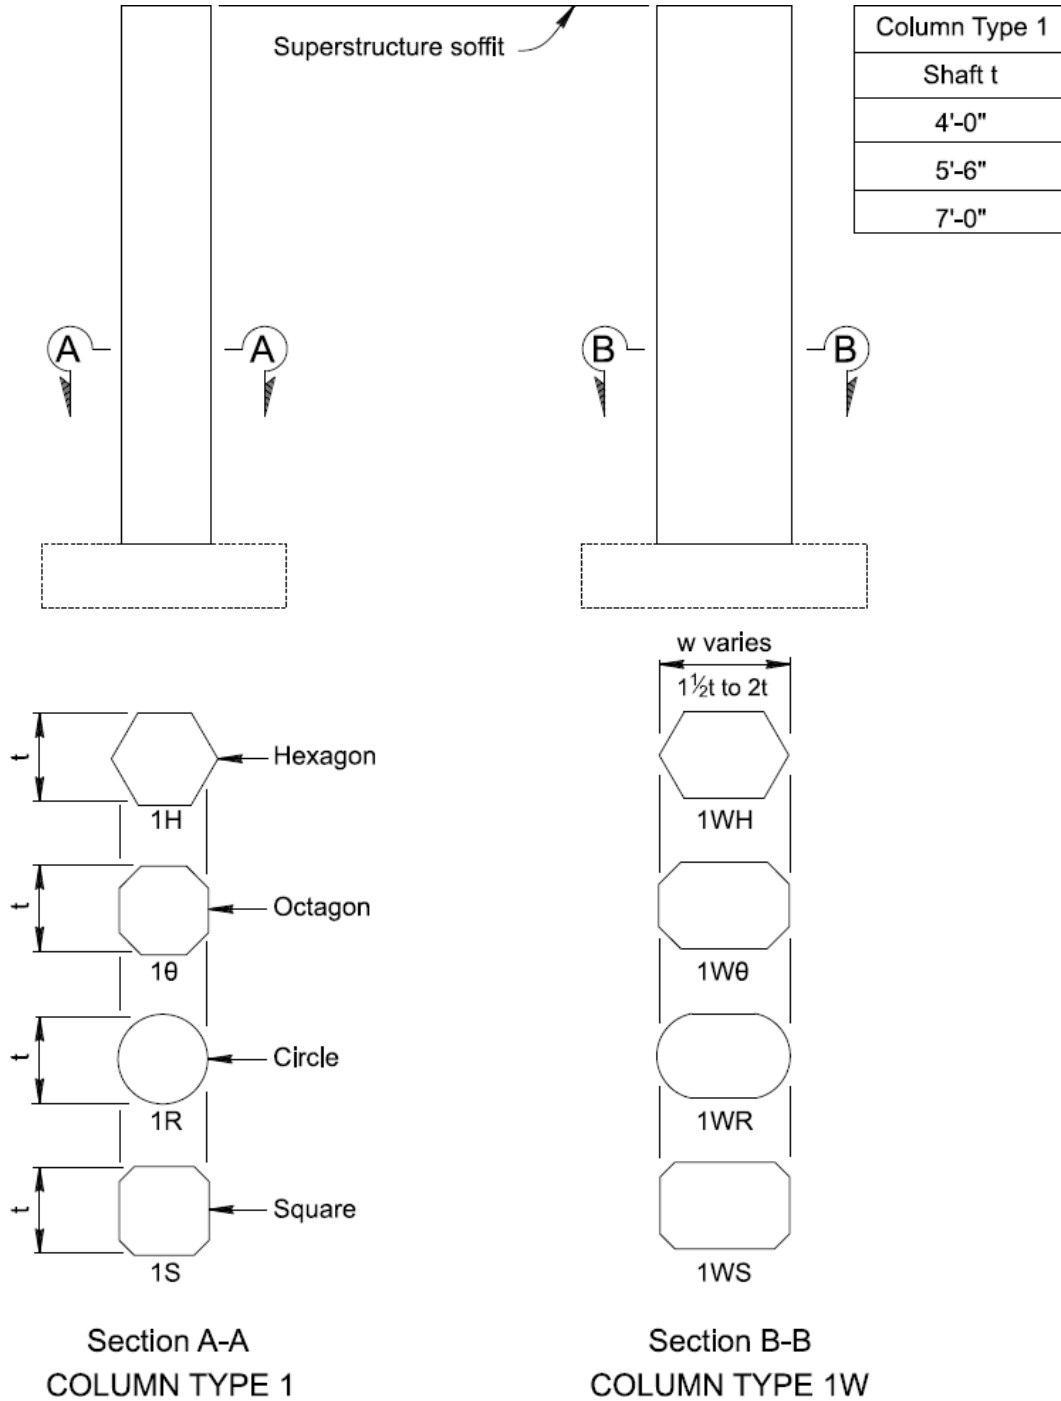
Type 1 Standard Prismatic Columns
